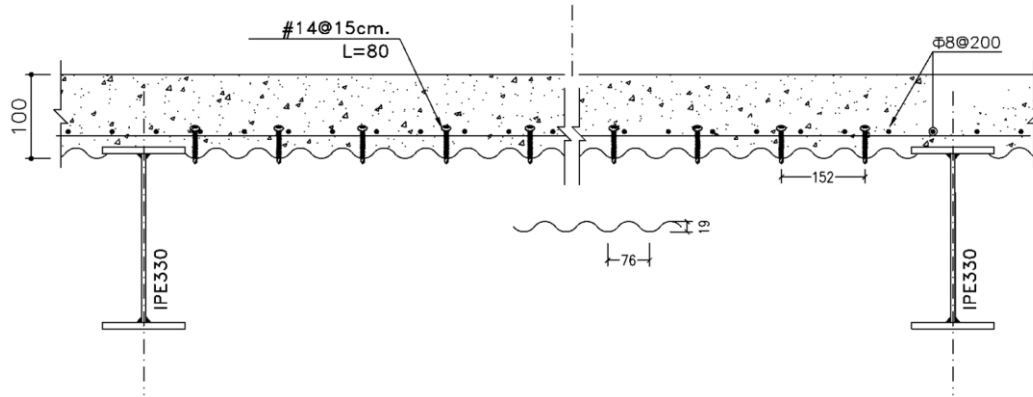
Typical slab reinforcement and arrangement of the metal deck (Scale: 1/10)
